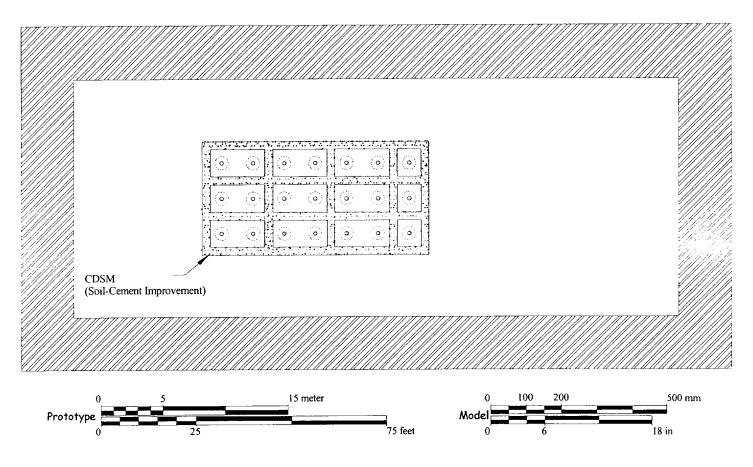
Plan view of the model showing the container, location of the clay soil improvement, piles and pile caps.
